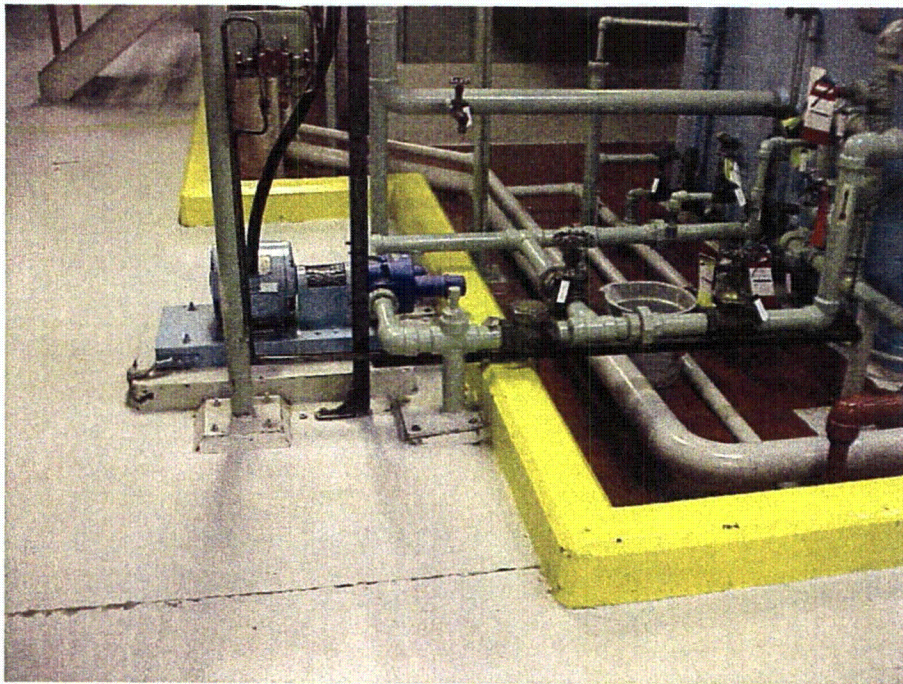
A leak from the turbine oil pump outside of berm would go to Turbine Building sump.
